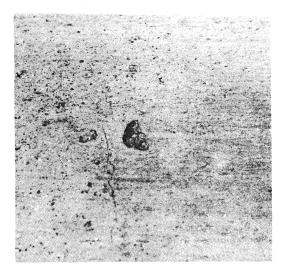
(b) Surface spalling at an early stage of development. Note cracking at location of steel.
